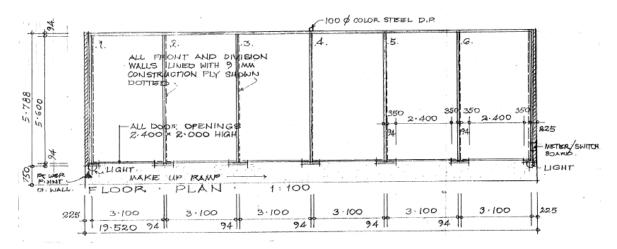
Floor plan of the garage at Weaver Courts Housing Complex.
